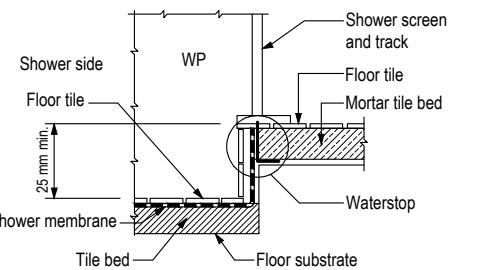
Typical unenclosed stepped down shower construction (membrane below tile bed)
